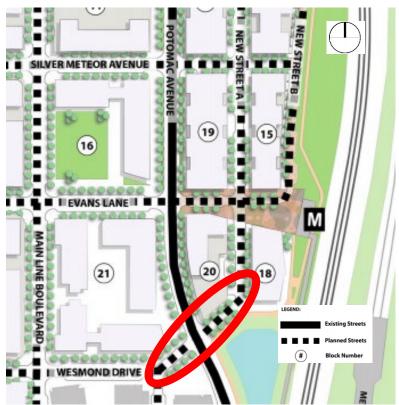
Road framework plan from the North Potomac Yard Small Area Plan where Wesmond Drive continues eastward from Route 1 to Potomac Avenue.
